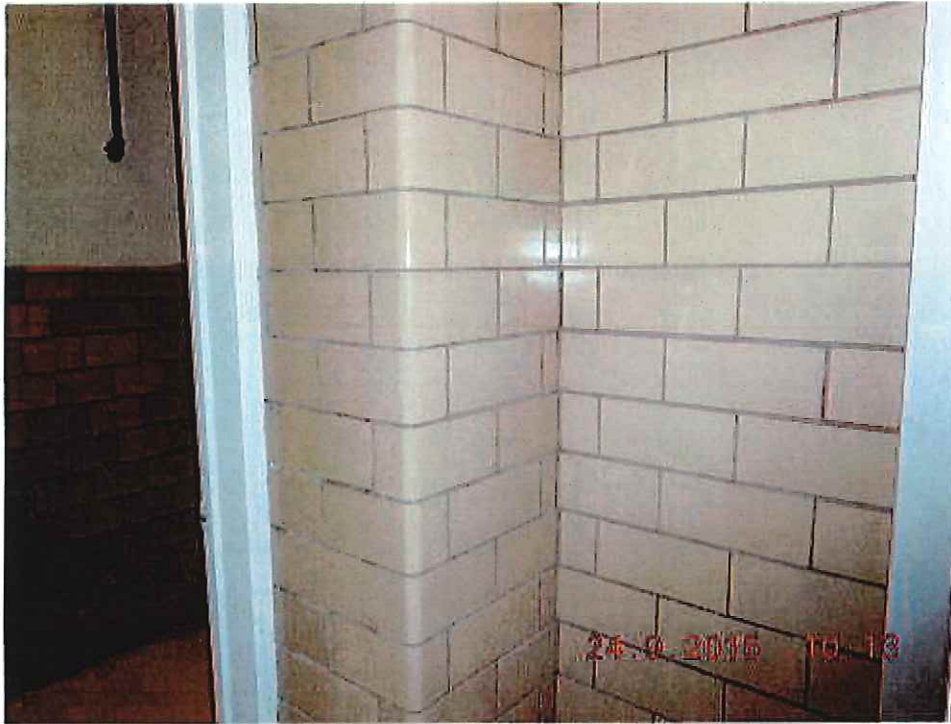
Kitchen glazed block wall has a lead paint component. NO other glazed block tested positive in the building.
